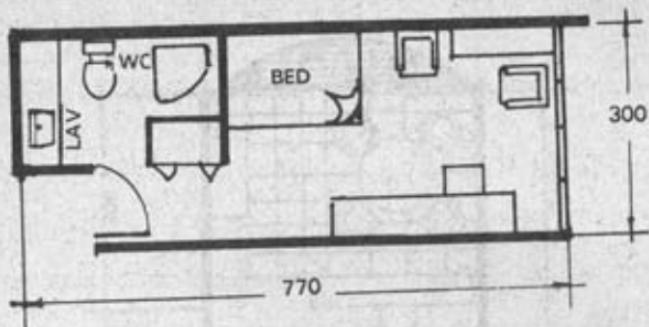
PLAN OF DOUBLE BEDDED GUEST ROOM
